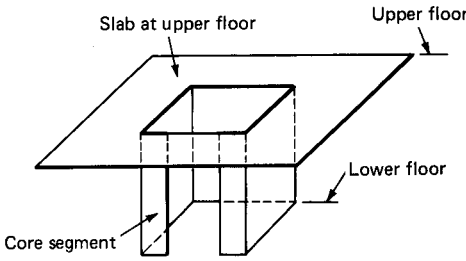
Story segment consisting of core segment between two floors and slab at upper floor.
